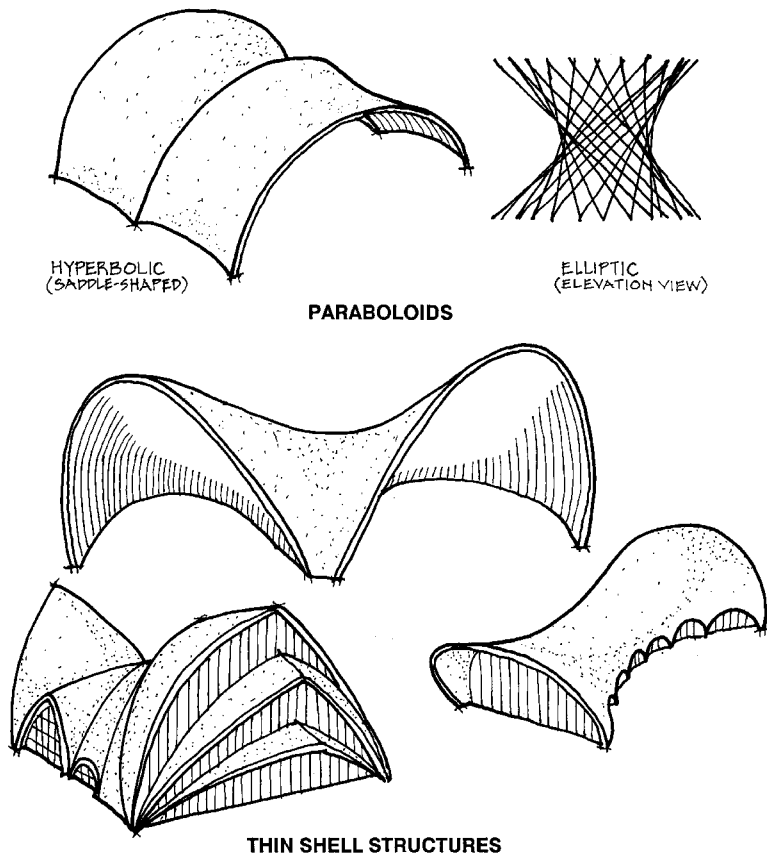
Concrete shell structure built as a hyperbolic paraboloid
